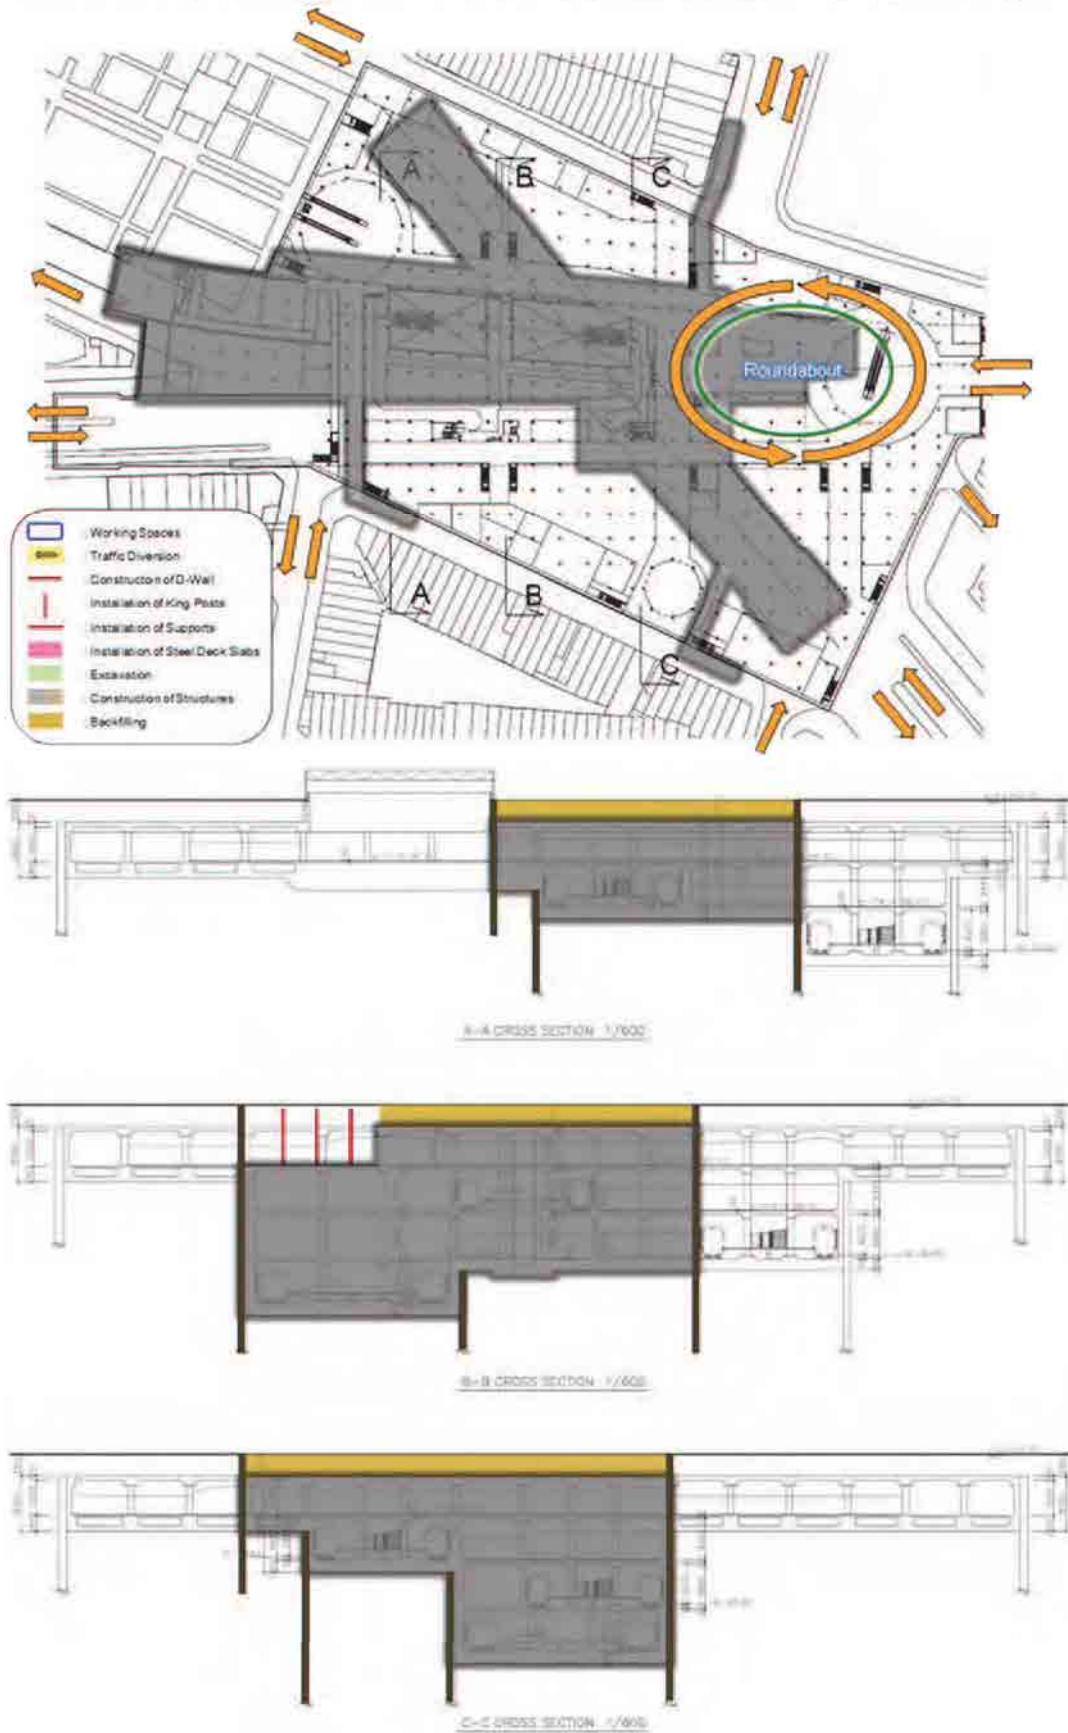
Construction Sequences of Ben Thanh Central Station (10/24)
